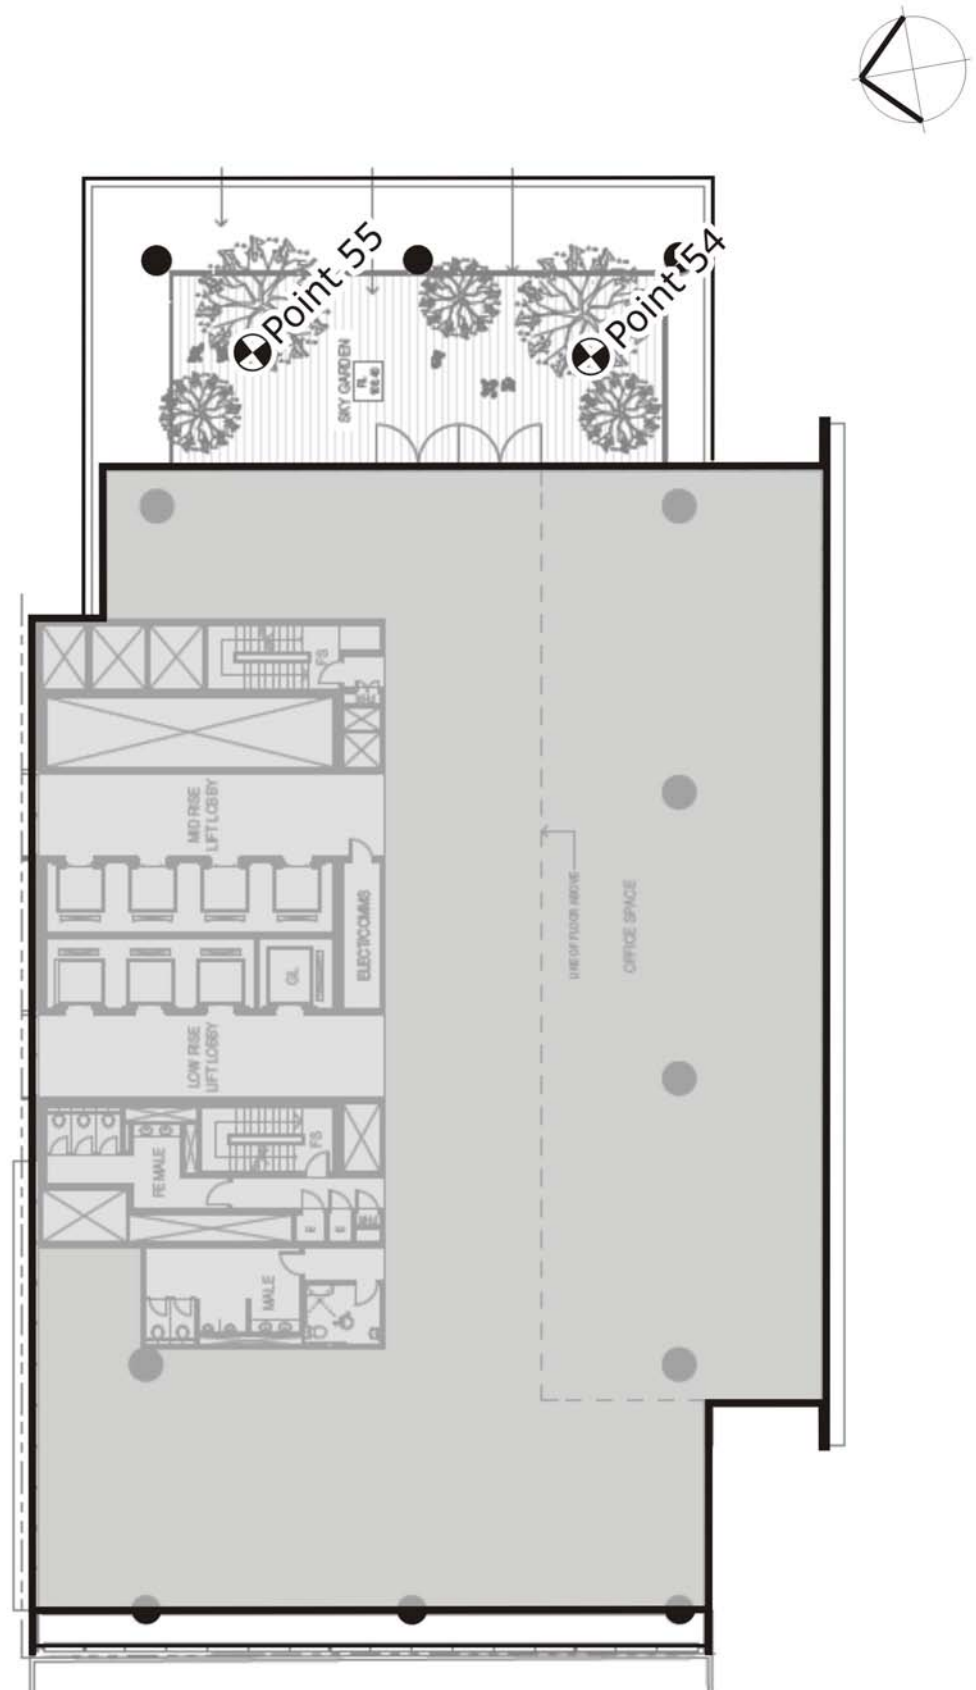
Study Point Locations – Beau Monde Residential Tower
